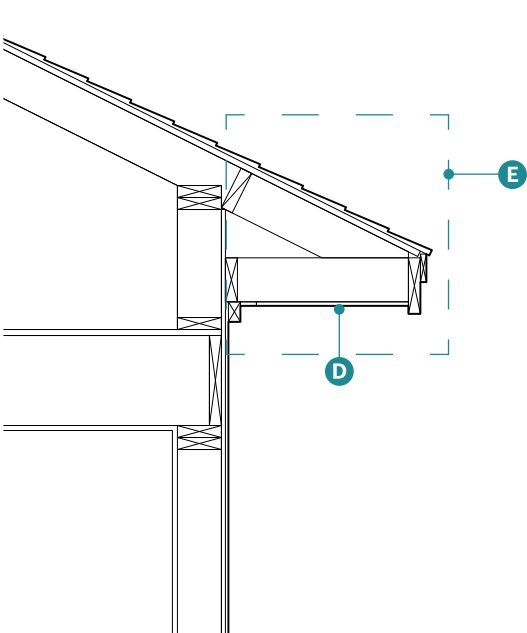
Subsection Detail of Highest Eave for Pitched Roof
